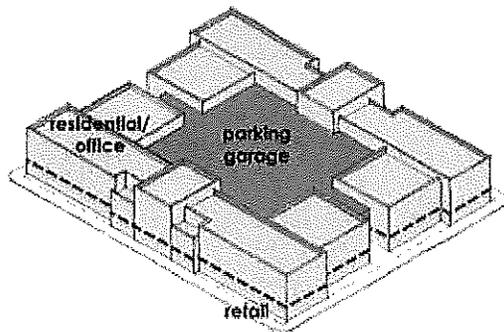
An illustration of a project that incorporates a parking garage within the site design
